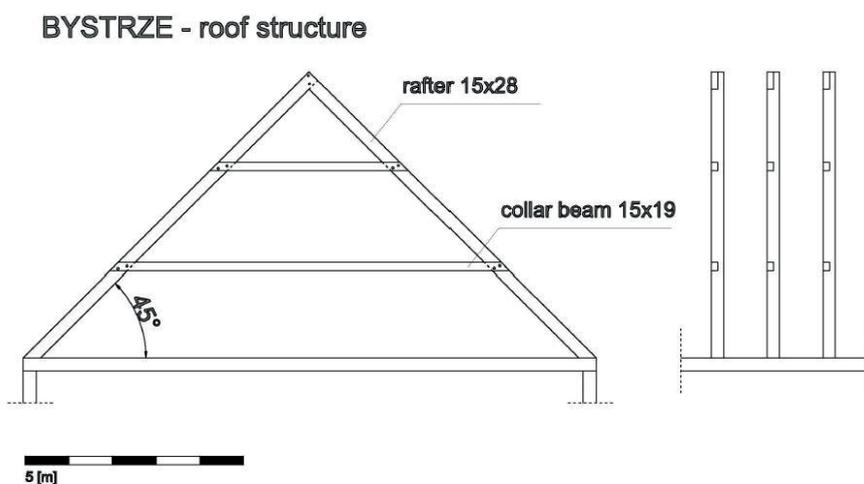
The simplified scheme of the roof structure of the arcaded house in Bystrze. (author's study)
